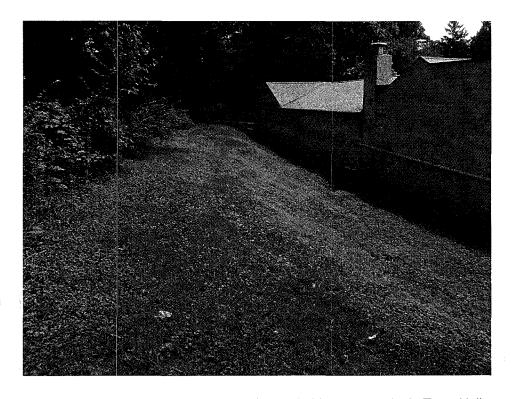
Crest and landward slope of levee behind Rocky Ripple Town Hall (Looking northeast near Station 50+50)
